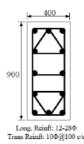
Detailed CL 15 and 19 Column Section (Ground to 2nd Floor)
